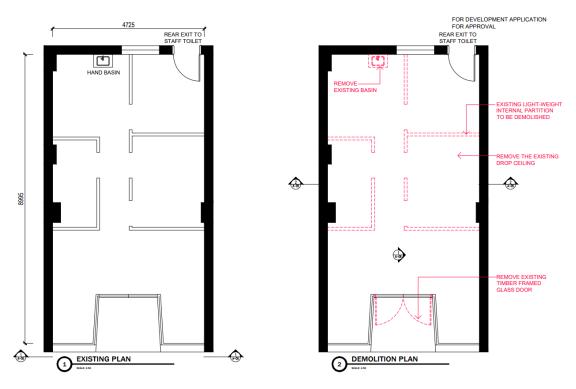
Ground floor plan of the shop showing the proposed demolition of internal partition walls and ceilings, *Source: Aether Architects.
